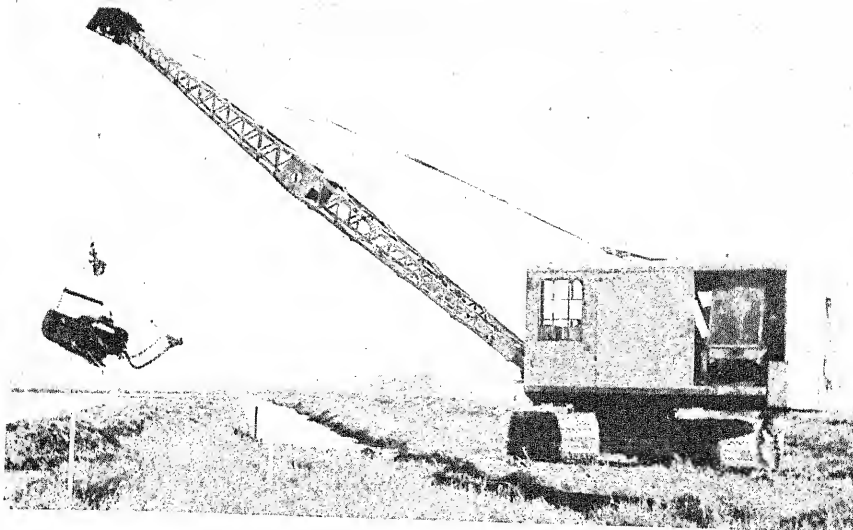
Tracklayer type of drag-line excavator mounted on wood "mats," excavating a main drainage ditch
